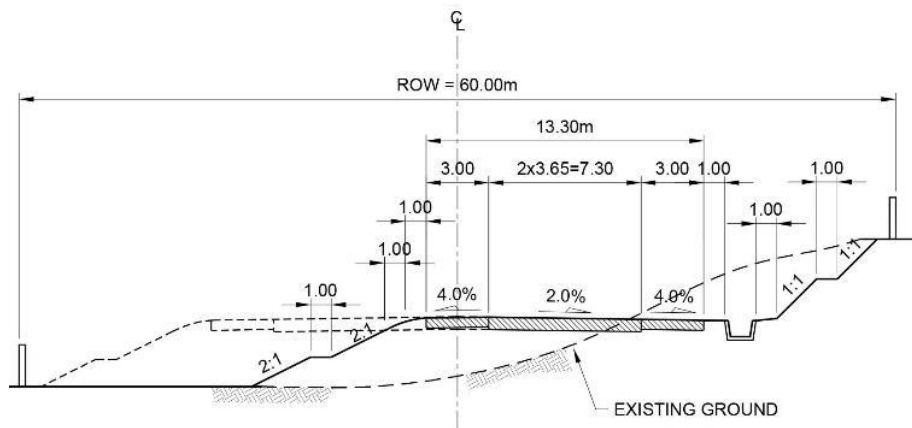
Typical Cross Section of CMH for 2 Lanes (Initial Stage)
